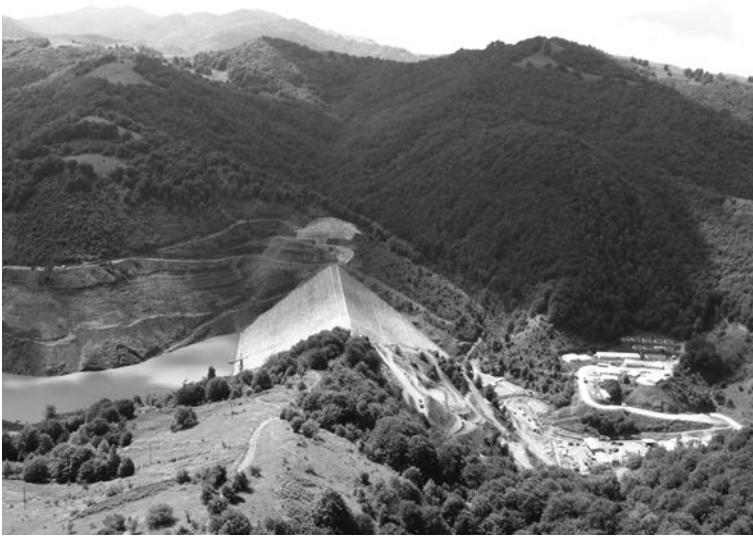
Knezhevo dam, first Macedonian embankment dam with asphaltic concrete core.
